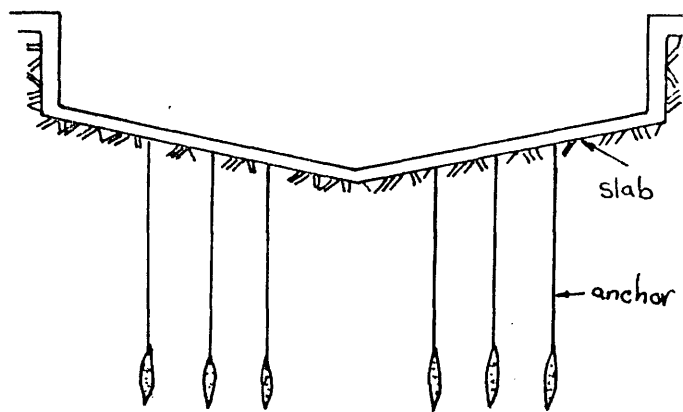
SKETCH OF DRY-DOCK SLAB SUPPORTED BY ANCHORS.
